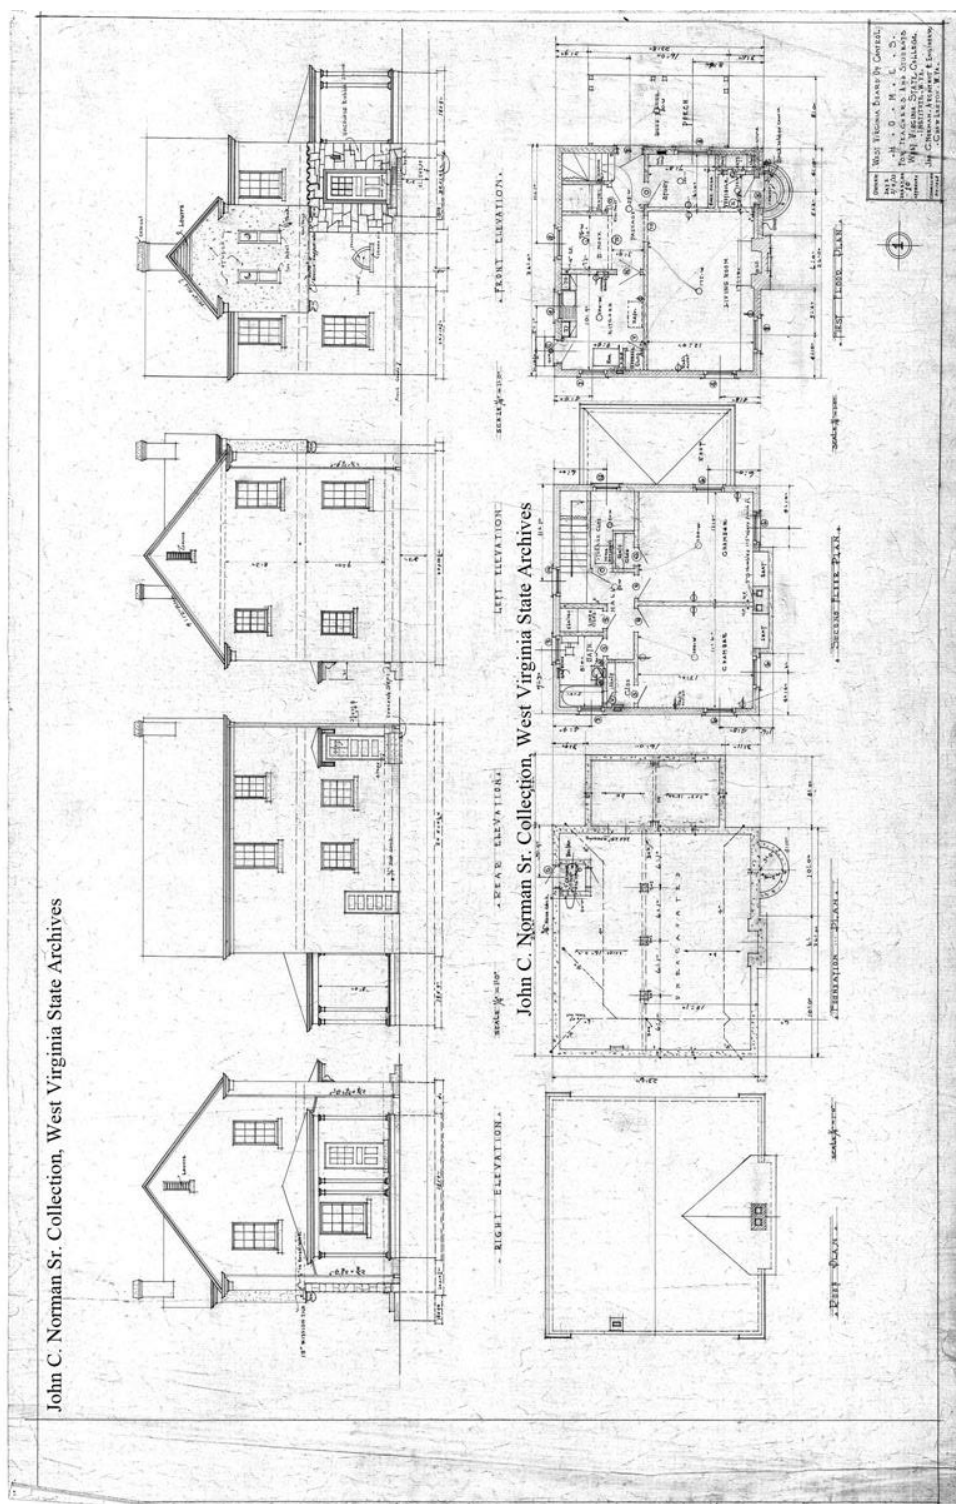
Faculty House I Floor Plan, Courtesy of the West Virginia State Archives, John C. Norman Sr. Collection
